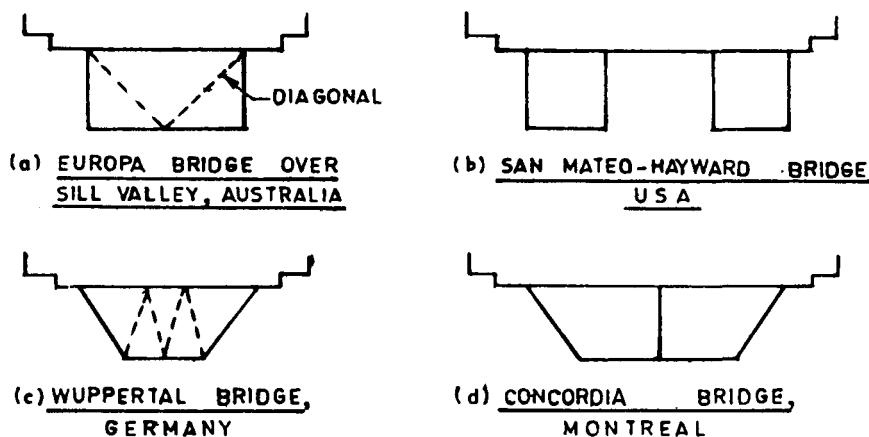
VARIOUS BOX-GIRDER CROSS-SECTIONS
